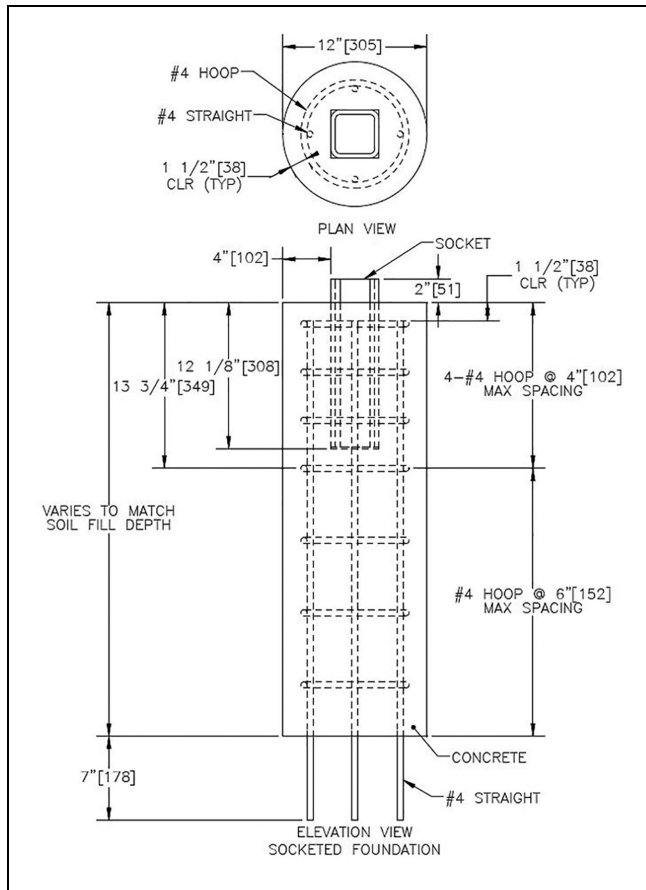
Cylindrical concrete foundation design for 12.5 in. and 36 in. soil fill depths.
